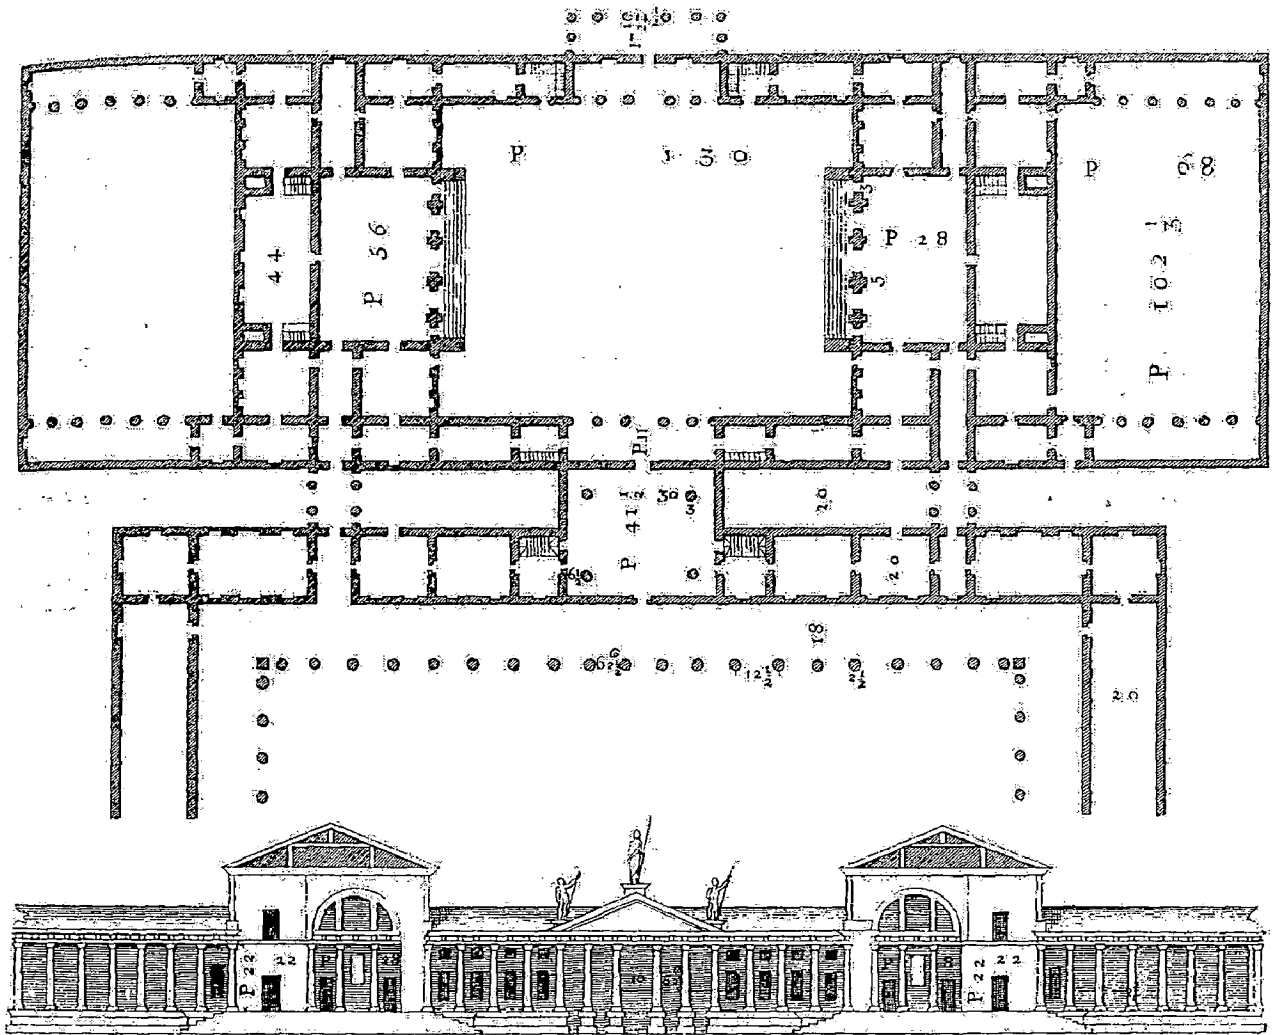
Villa Ottavio (Ottavie) Thiene at Quinto in plan and elevation
